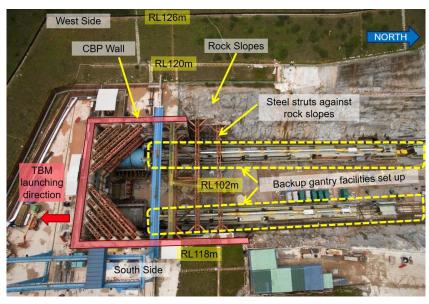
Aerial View of the Launch Shaft – some steel struts were strutted against the rock slopes
